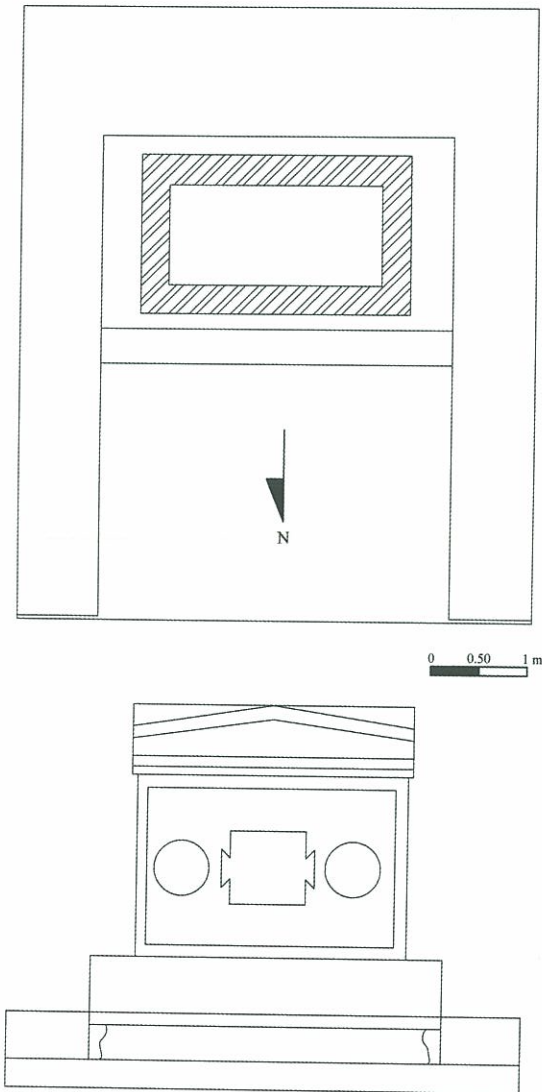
Idebessos, tomb with exedra 3, plan, facade elevation.
